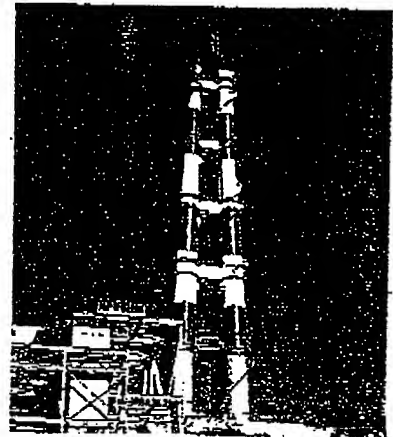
Tokyo Electric Company Chimney, Yokohama Power Station
